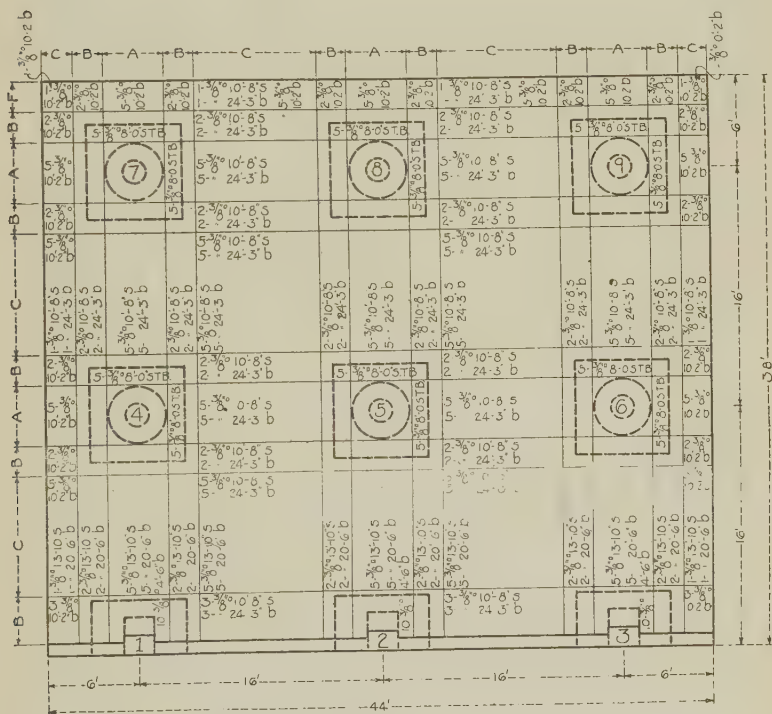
REINFORCING PLANS FOR SLAB S.
